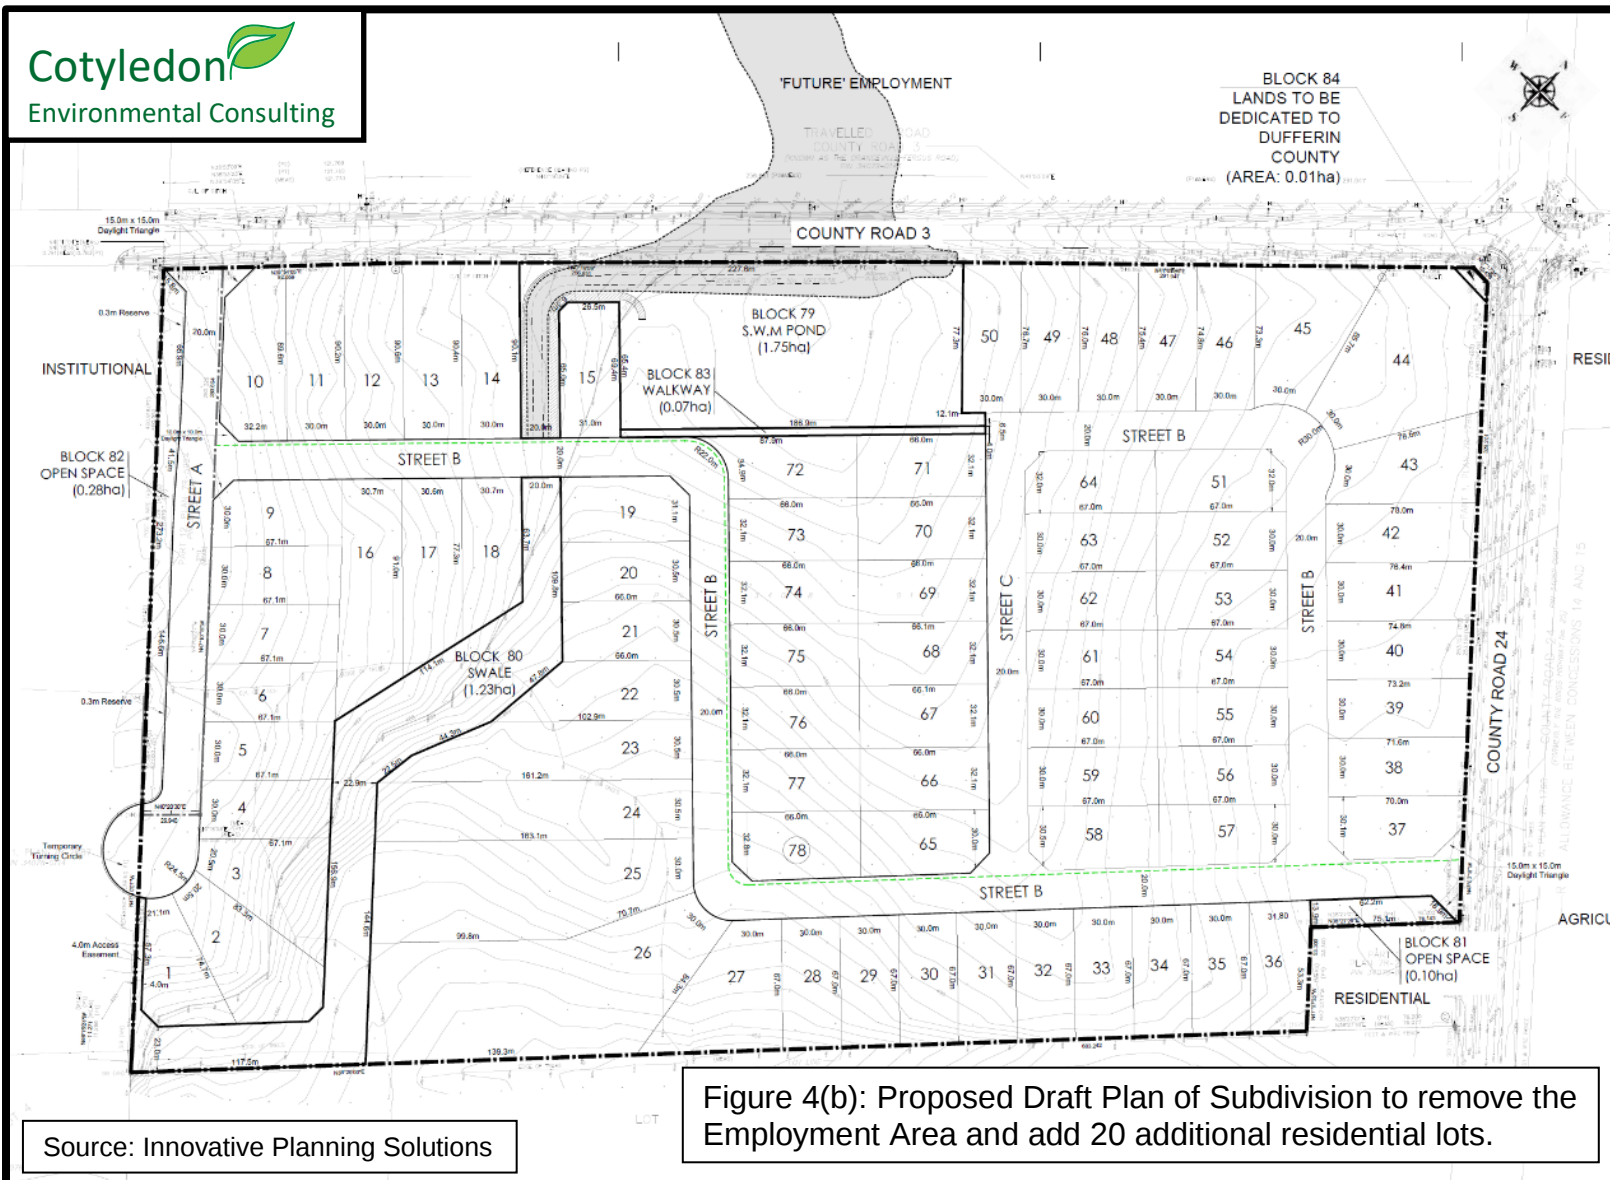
(b): Proposed Draft Plan of Subdivision to remove the Employment Area and add 20 additional residential lots.
